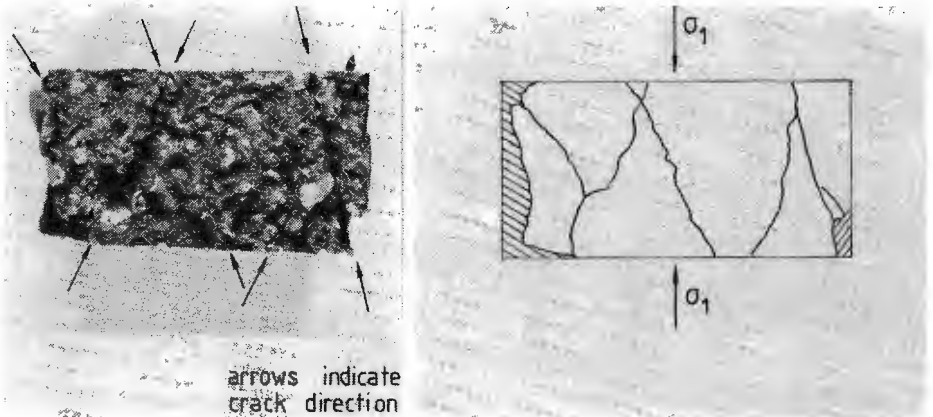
Alternating positions of cone-shaped rest-pieces for small sized specimens.
